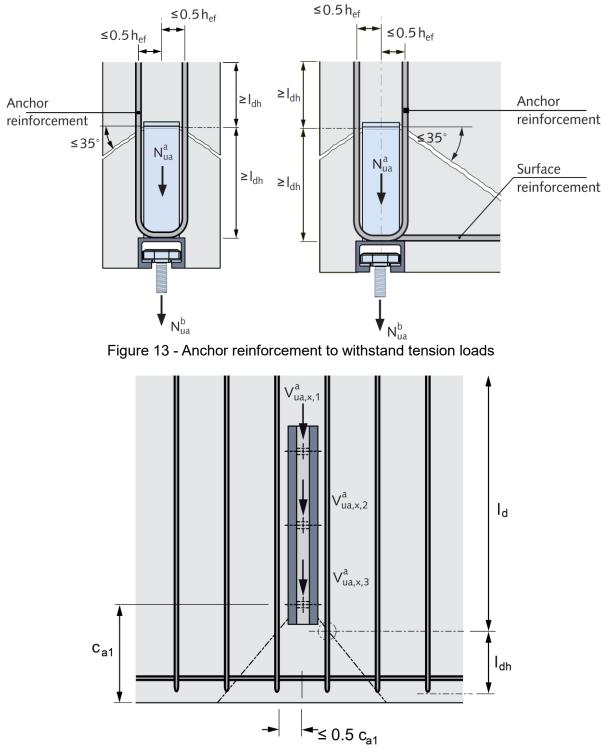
Anchor reinforcement to withstand longitudinal shear
